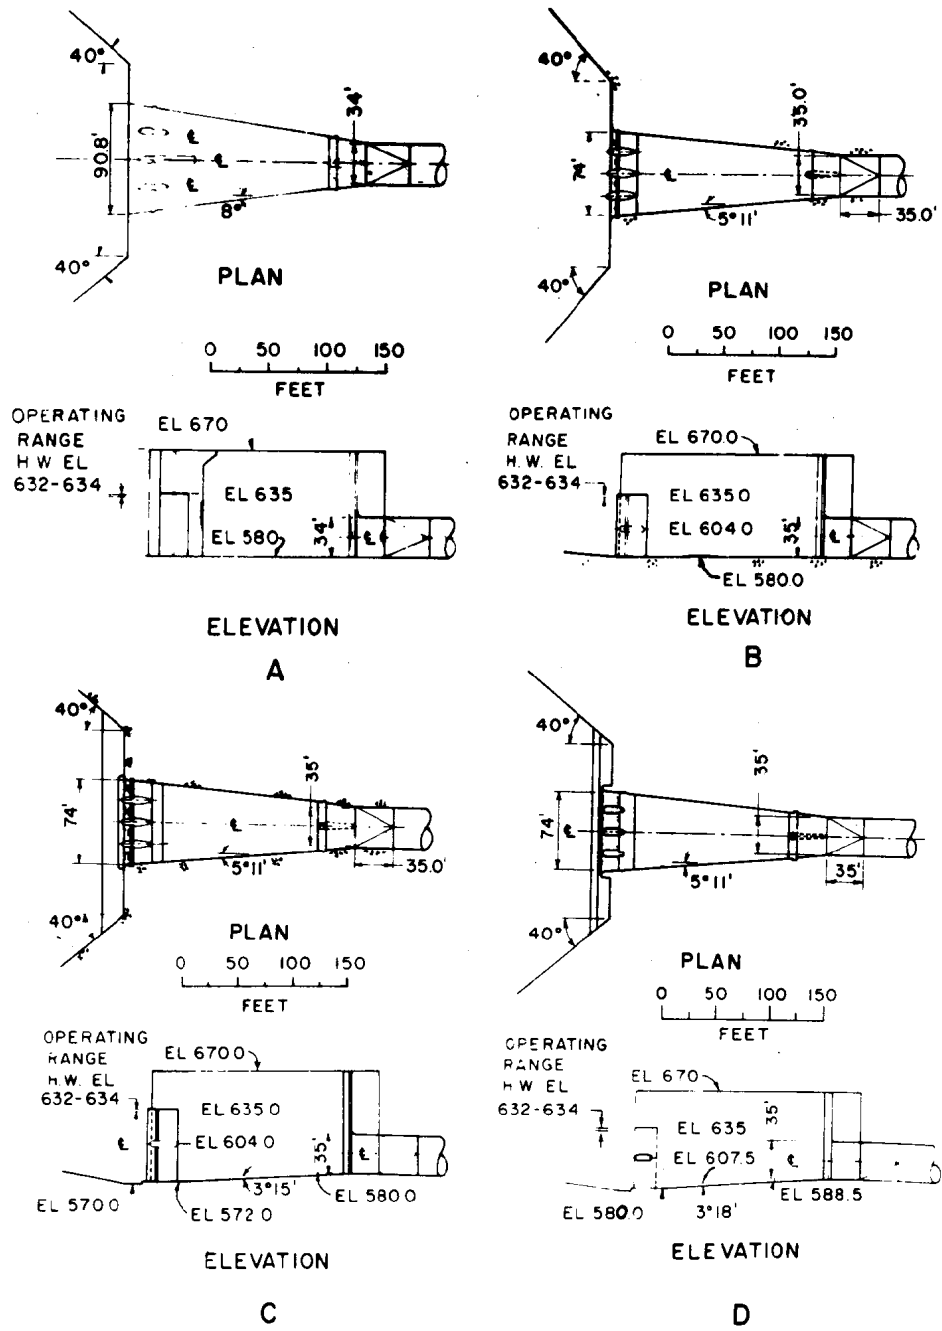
NICKAJACK RESERVOIR INLET-OUTLET STRUCTURE
